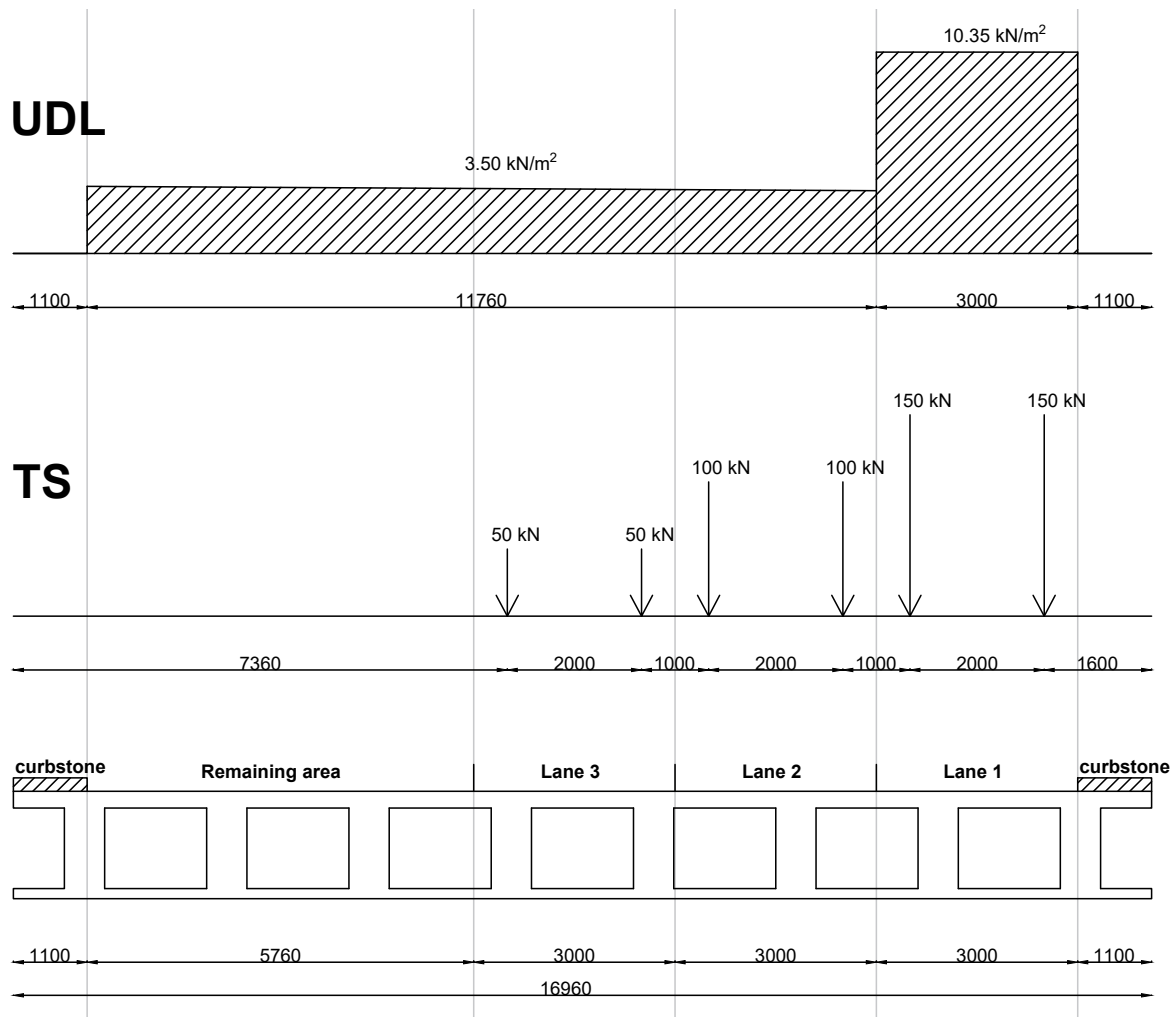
Cross-section of the bridge deck, lane layout and side view of traffic load (UDL and TS) (mm)
